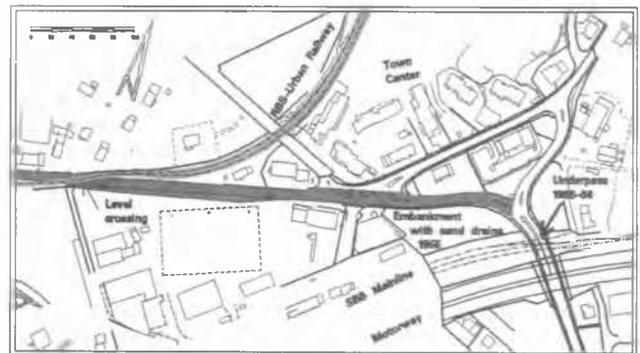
Situation prior to tunnel construction with grade crossing of urban railway with road, showing location of main railway and motorway.
